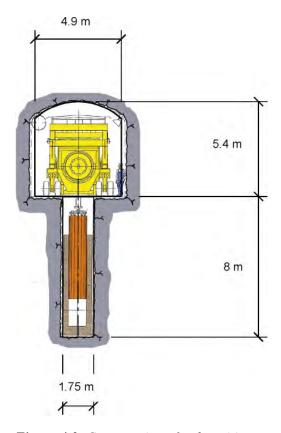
Cross-section of a deposition tunnel and a deposition hole together with the equipment for installation of canisters (given by SKB).
